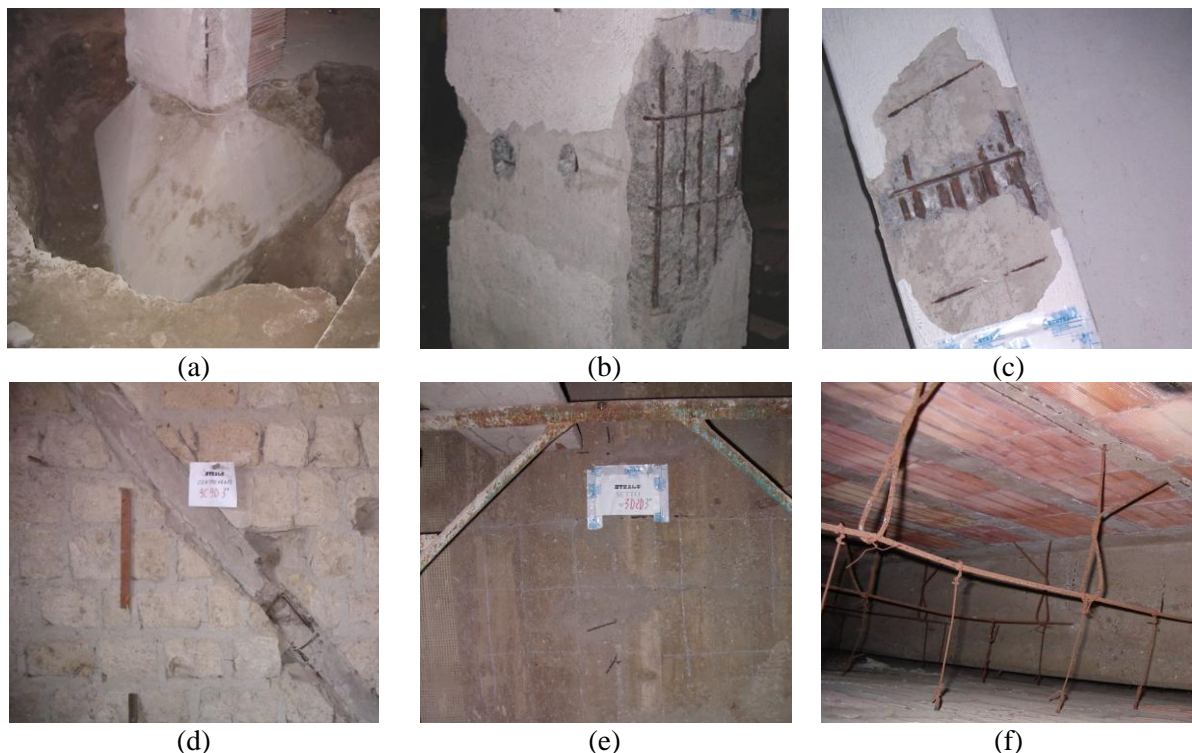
In situ inspections: (a) foundation footing; (b) columns’ and (c) beams’ reinforcement; (d) concrete diagonal brace in tuff masonry infill; (e) concrete infill; (f) floor slabs.
